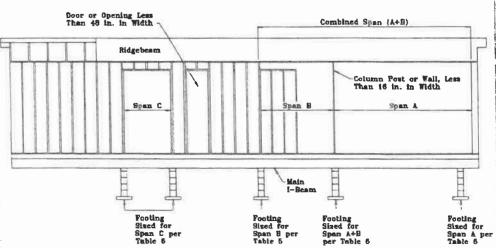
A. Typical marriage line support locations for homes not requiring perimeter supports
